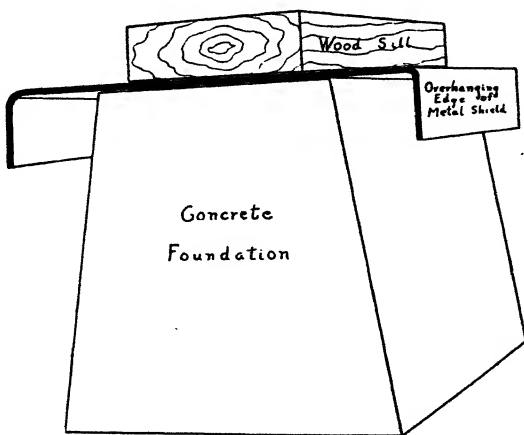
Diagram of cross section of a building foundation structure built to guard against attack by the subterranean termite. Concrete foundations are subject to cracking, and if a continuous metal shield is not laid between the concrete and the wood sill, infestation may occur by way of an undetected crack. The overhanging metal will bring any runways the termites may build over the foundation out into the open where they may be seen. (After Light, 1929:26.)
